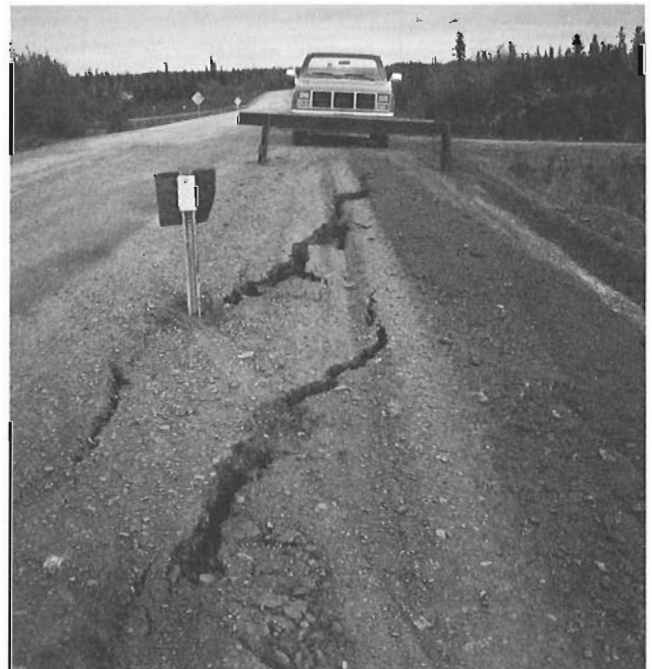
Longitudinal cracking in the road surface at Site 2, during September, 1987.
